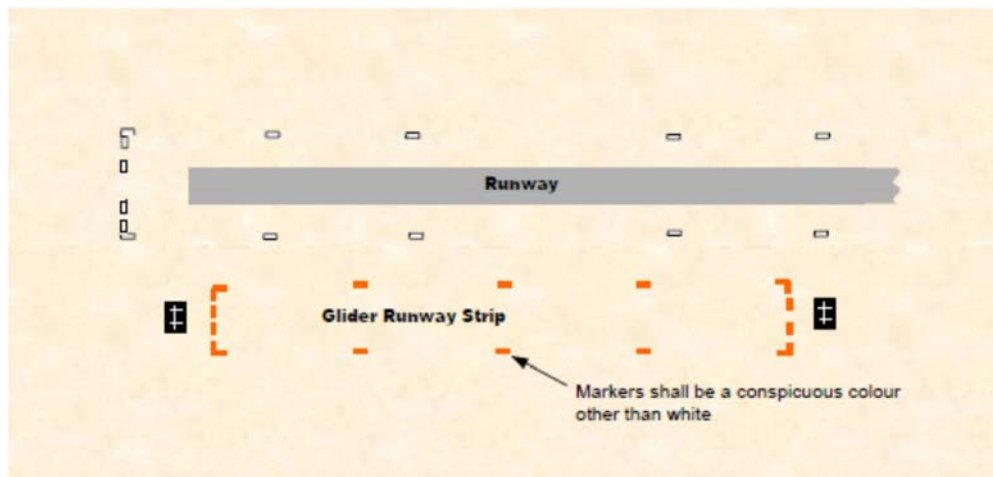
Glider runway strip outside an existing powered aircraft runway strip
